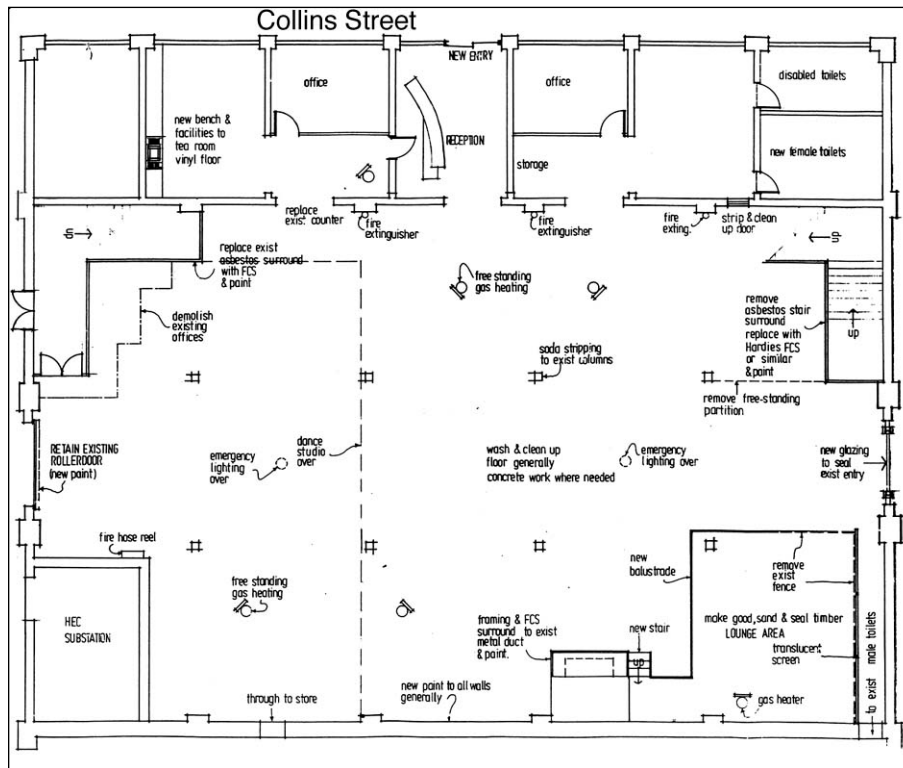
1997-8 plan showing converted layout of former markets and Collins St shops to Youth Centre (HCC 61-1-17 vol 4).
